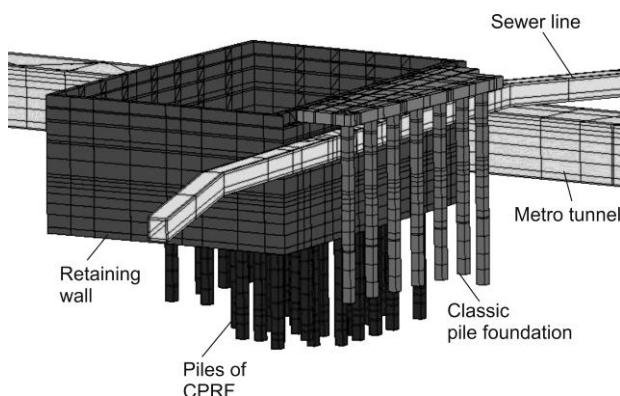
Numerical model of the south-west of the project area, Panorama building, view direction south-west.
